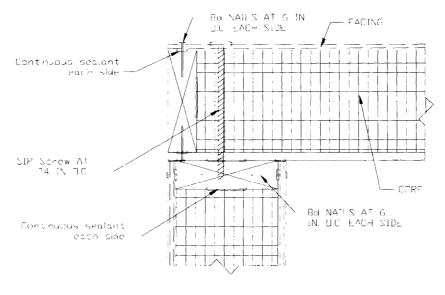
TYPICAL SIP SPLICING DETAILS
